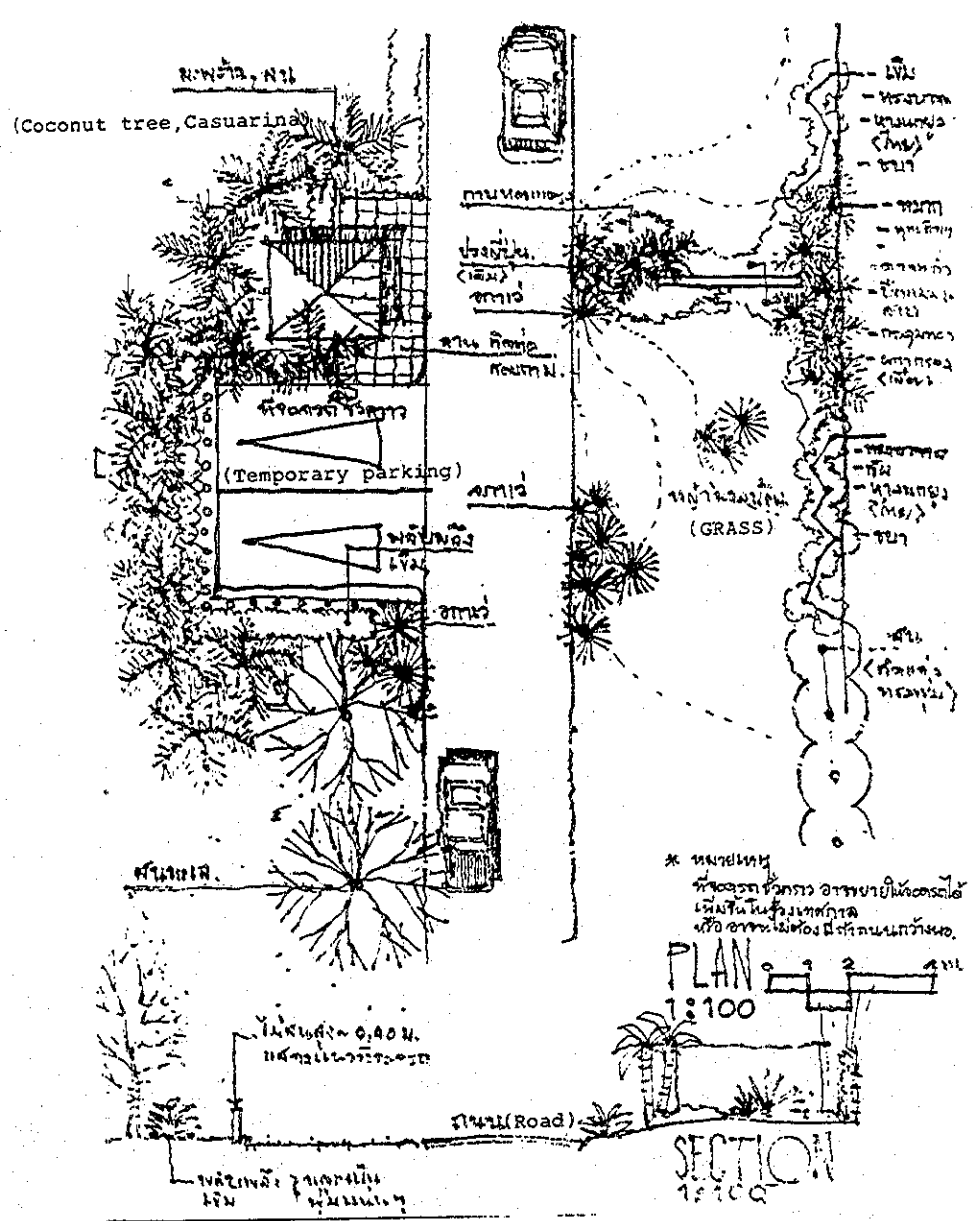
HAT NAI YANG NATIONAL PARK DETAIL PLAN OF ROAD
